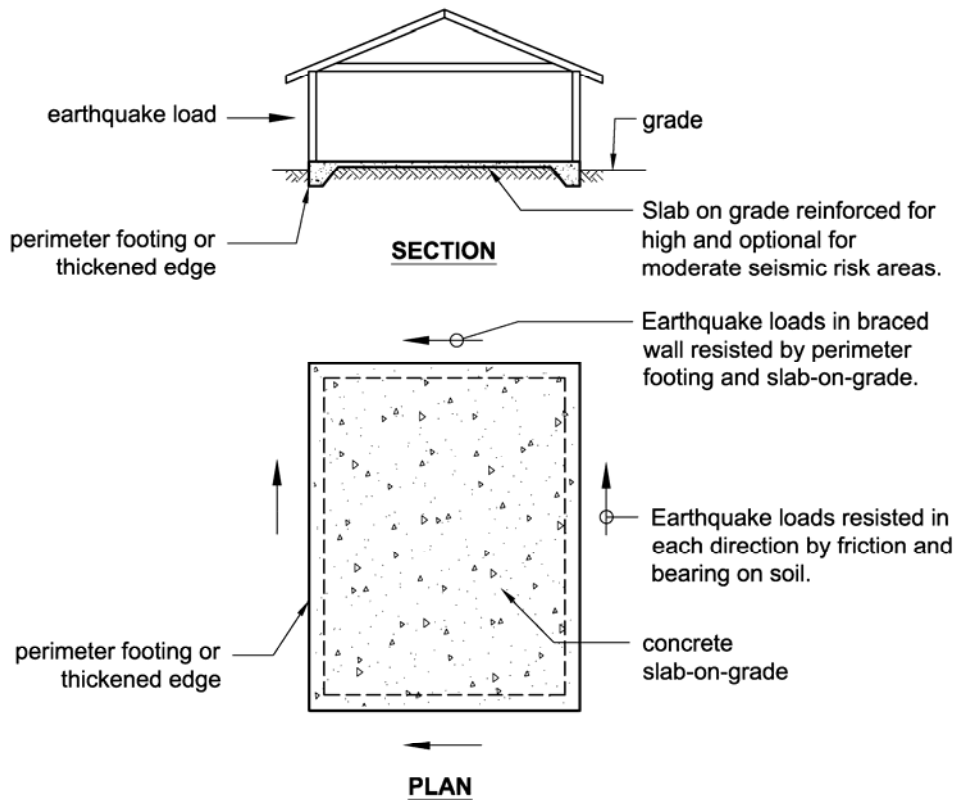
Slab-on-grade and perimeter footing transfer loads into soil.
